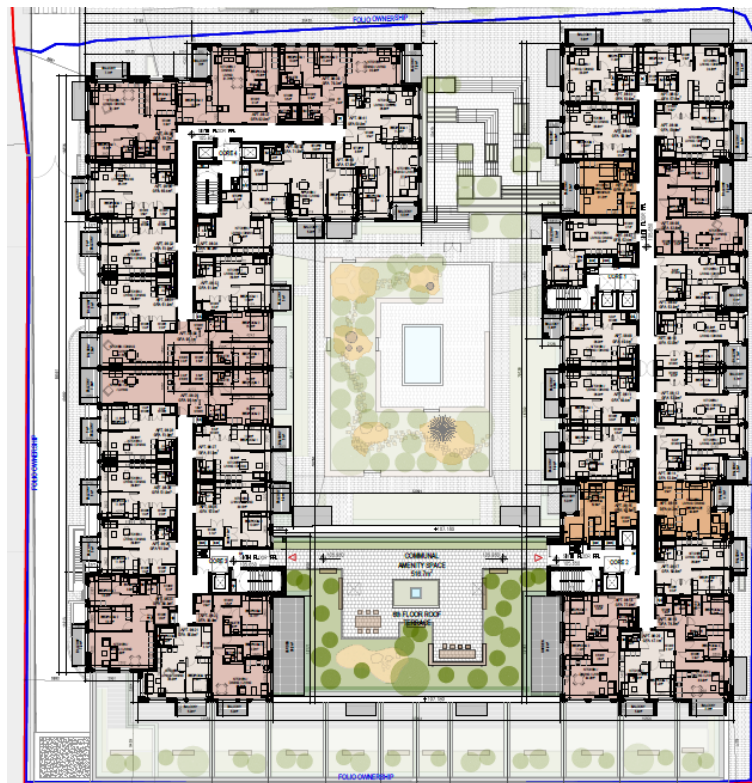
Sixth floor plan. We note the provision of a communal roof terrace at this level. 3 no. studio apartments, 28 no. one-bedroom apartments and 10 no. two-bedroom apartments are provided at this level.
